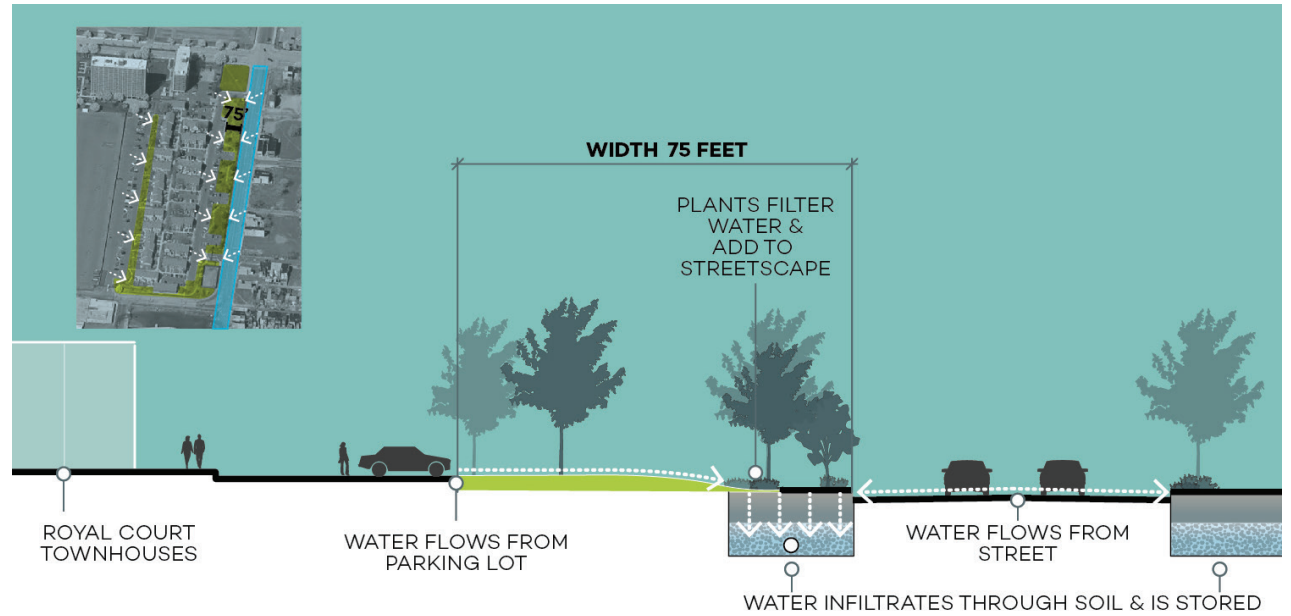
SECTION OF PROPOSED GREEN STREET ON 3RD STREET
